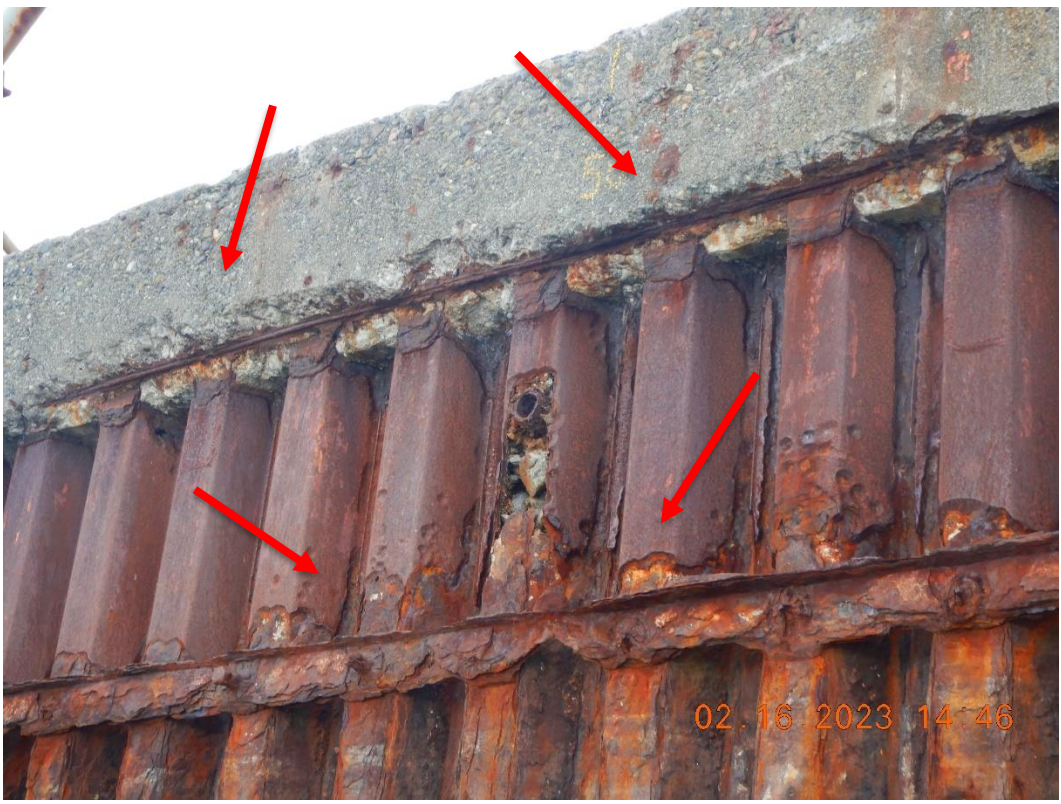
Typical major concrete cap spalling; typical severe upper water corrosion from STA 0+00 to 2+00
